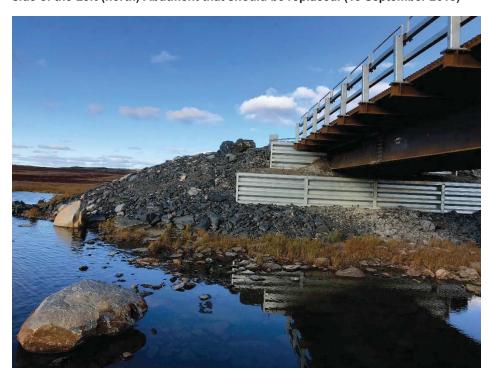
M-5 Bridge at KM10.5, photo of Left (north) Abutment, downstream side taken from the Right (south) Abutment (13 September 2018)
